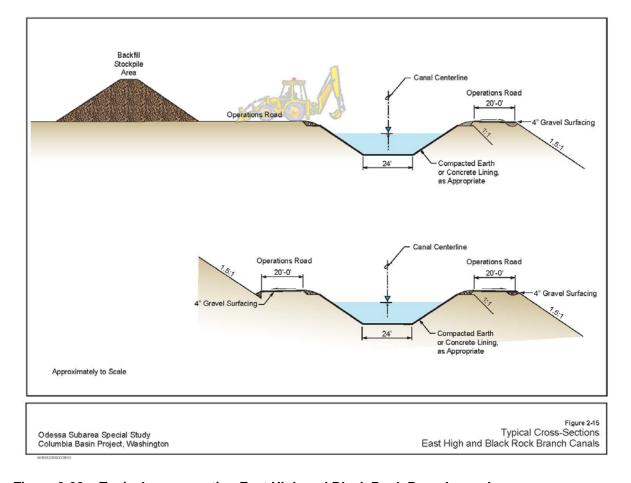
Typical cross-section East High and Black Rock Branch canals.
